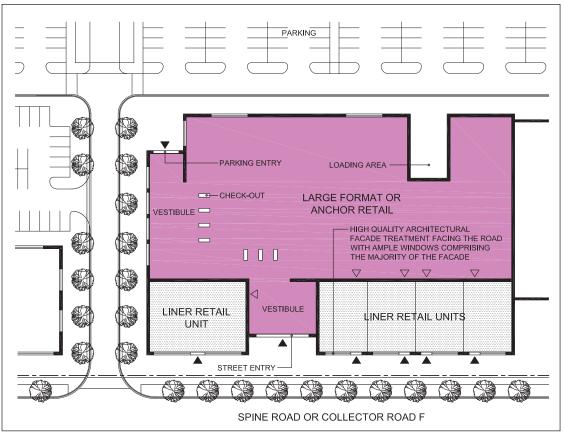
Conceptual plan depicting Anchor with Integrated Street Entry and Liner scenario.
